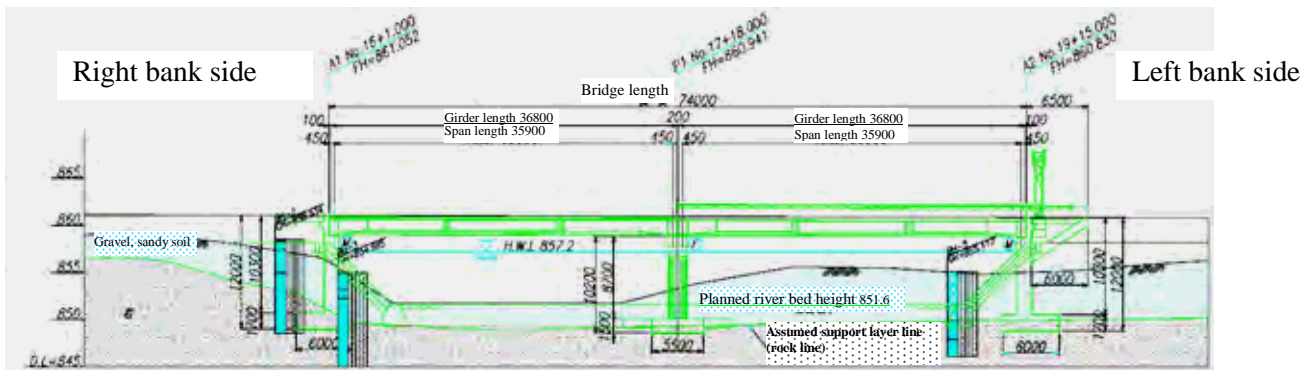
Cross Section Diagram of the Bridge Location
